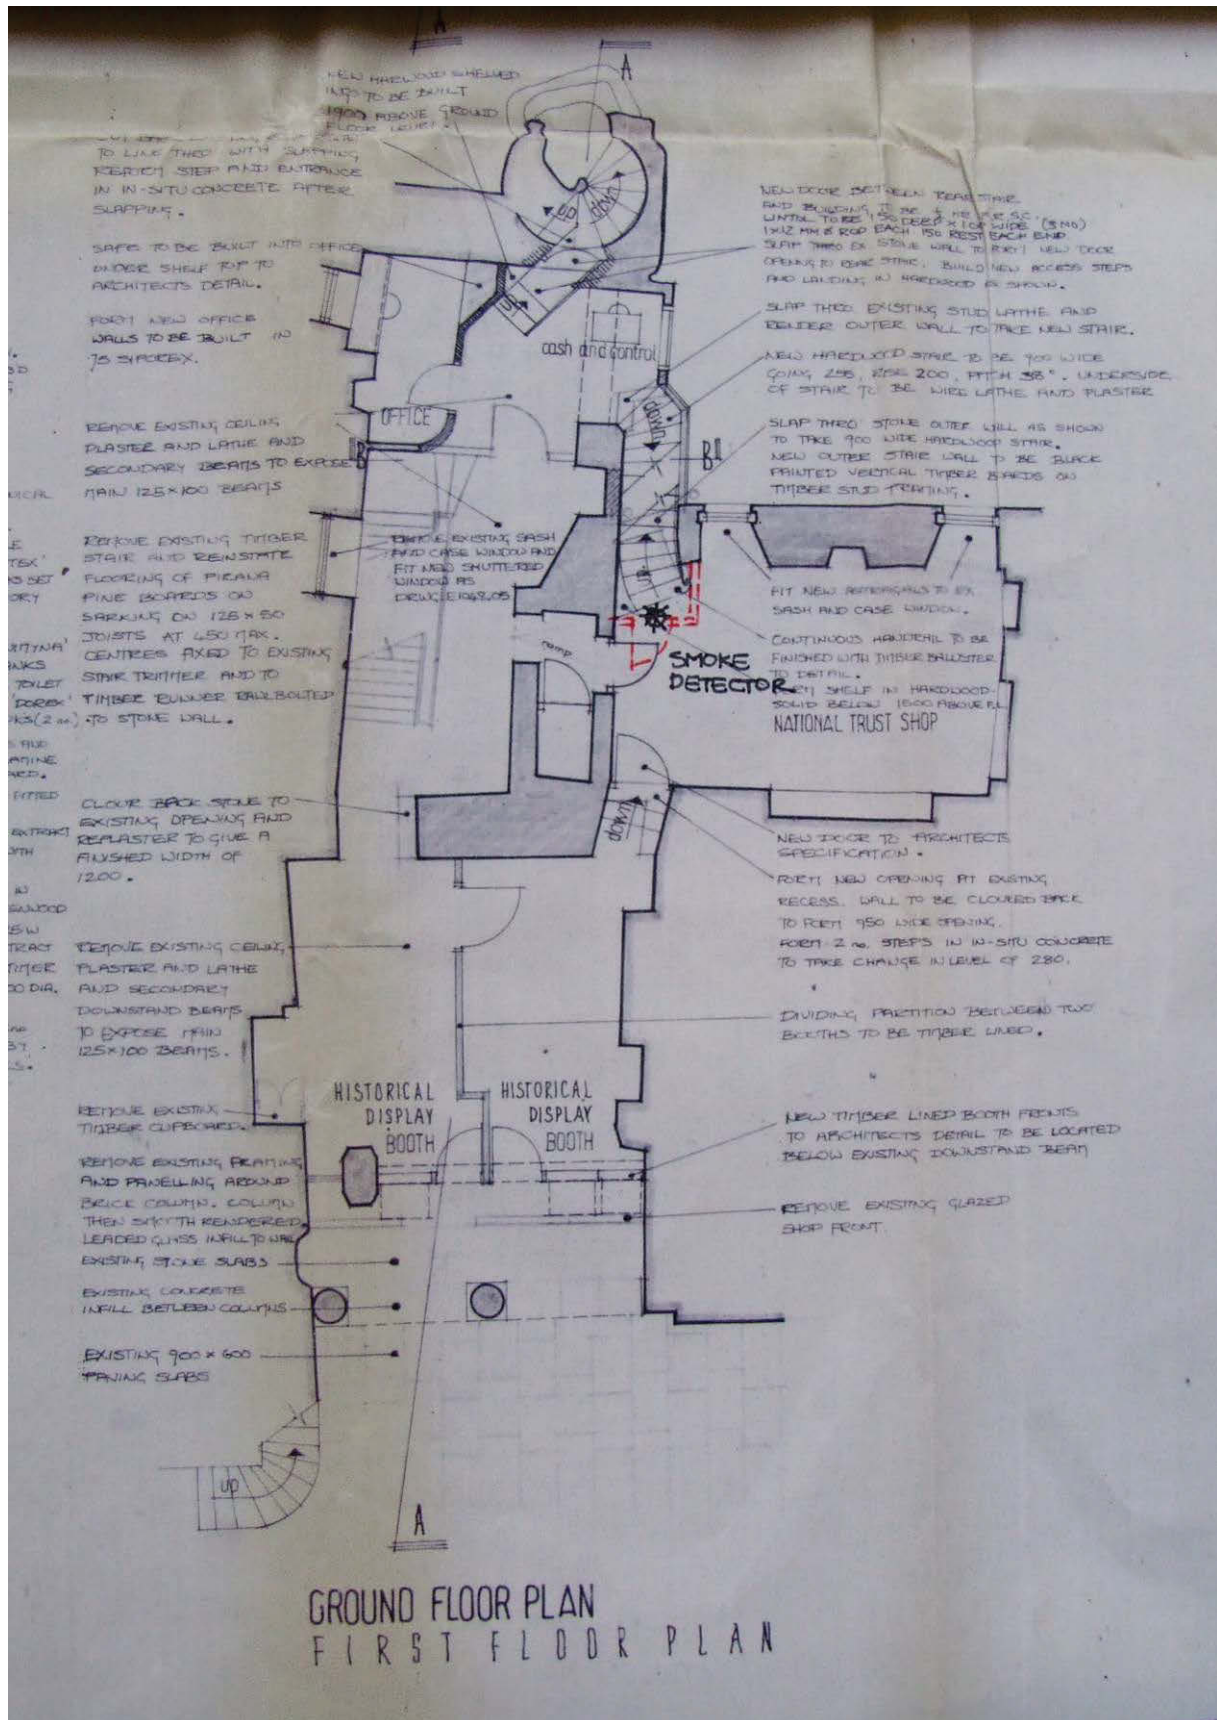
Plan showing alterations scheme for ground floor by Robert Hurd & Ptns. Granted building warrant September 1978, with 1980 amendment, to omit the smoke lobby. City of Edinburgh plan store
